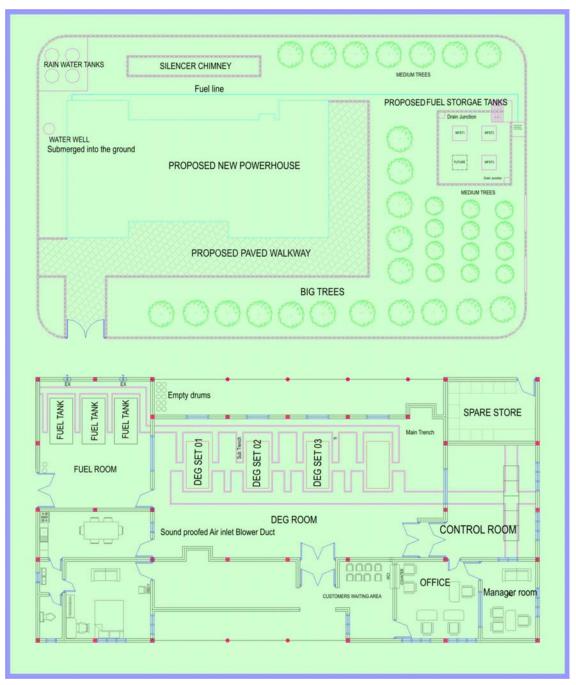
General layout of the powerhouse premises and powerhouse building (see tender document for details)
